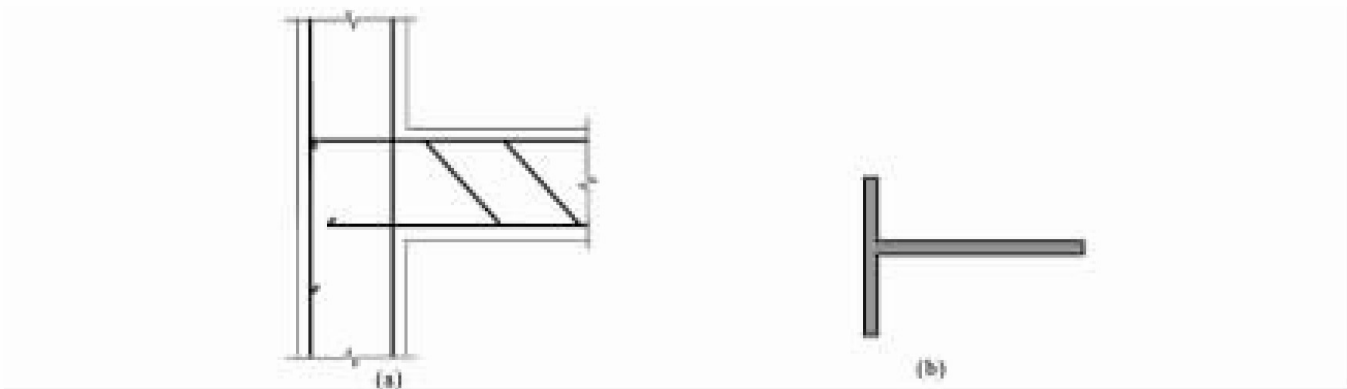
Connection of reinforced concrete bars and its computing model
